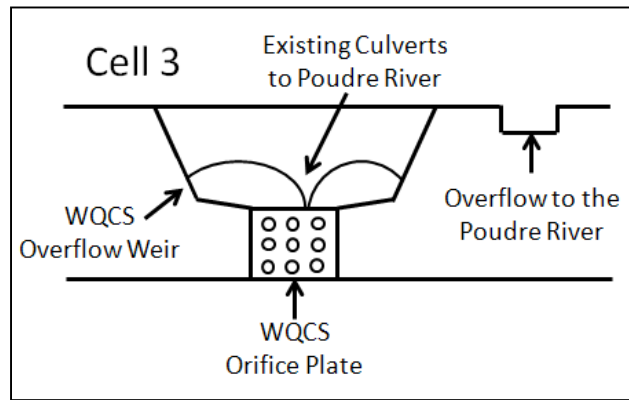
Sketch of the proposed WQCS design, not to scale.
